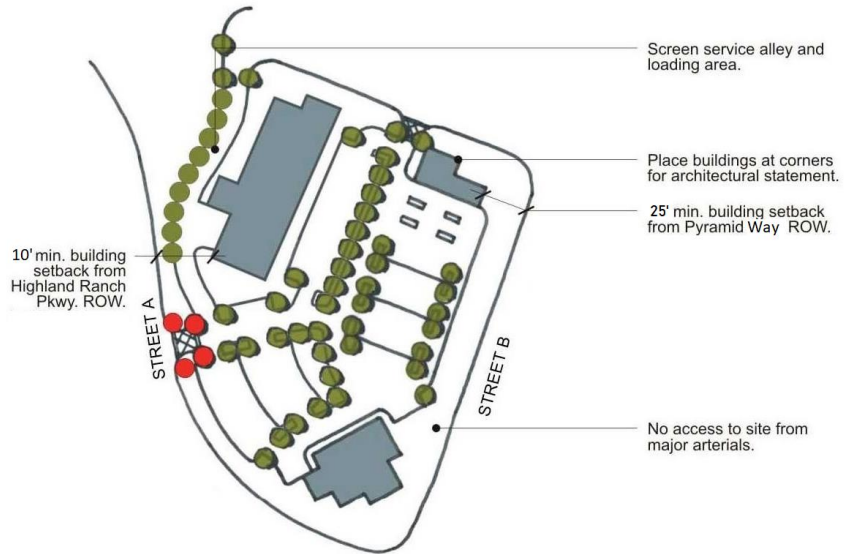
COMMUNITY COMMERCIAL CONCEPTUAL SITE PLAN
